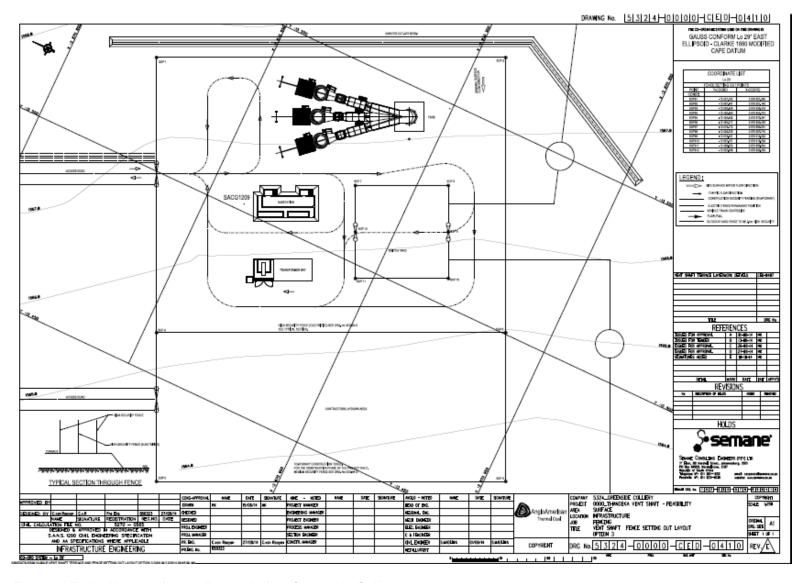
Typical layout of a ventilation shaft at Greenside Colliery
